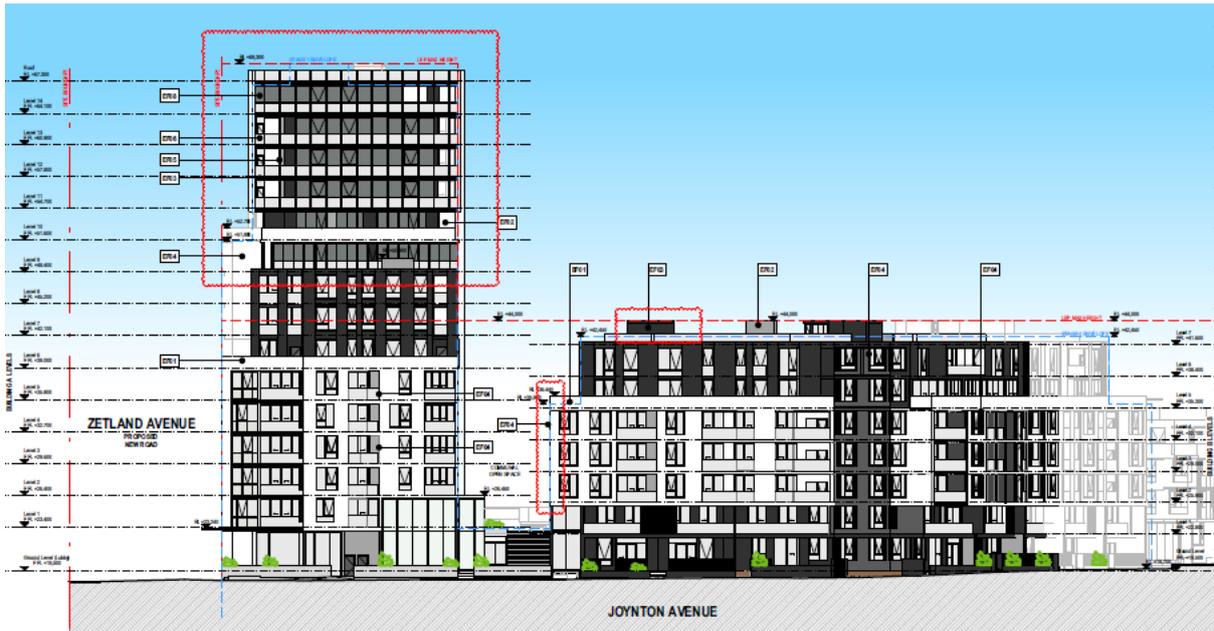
Proposed Joynton Avenue elevation of Buildings A and B
